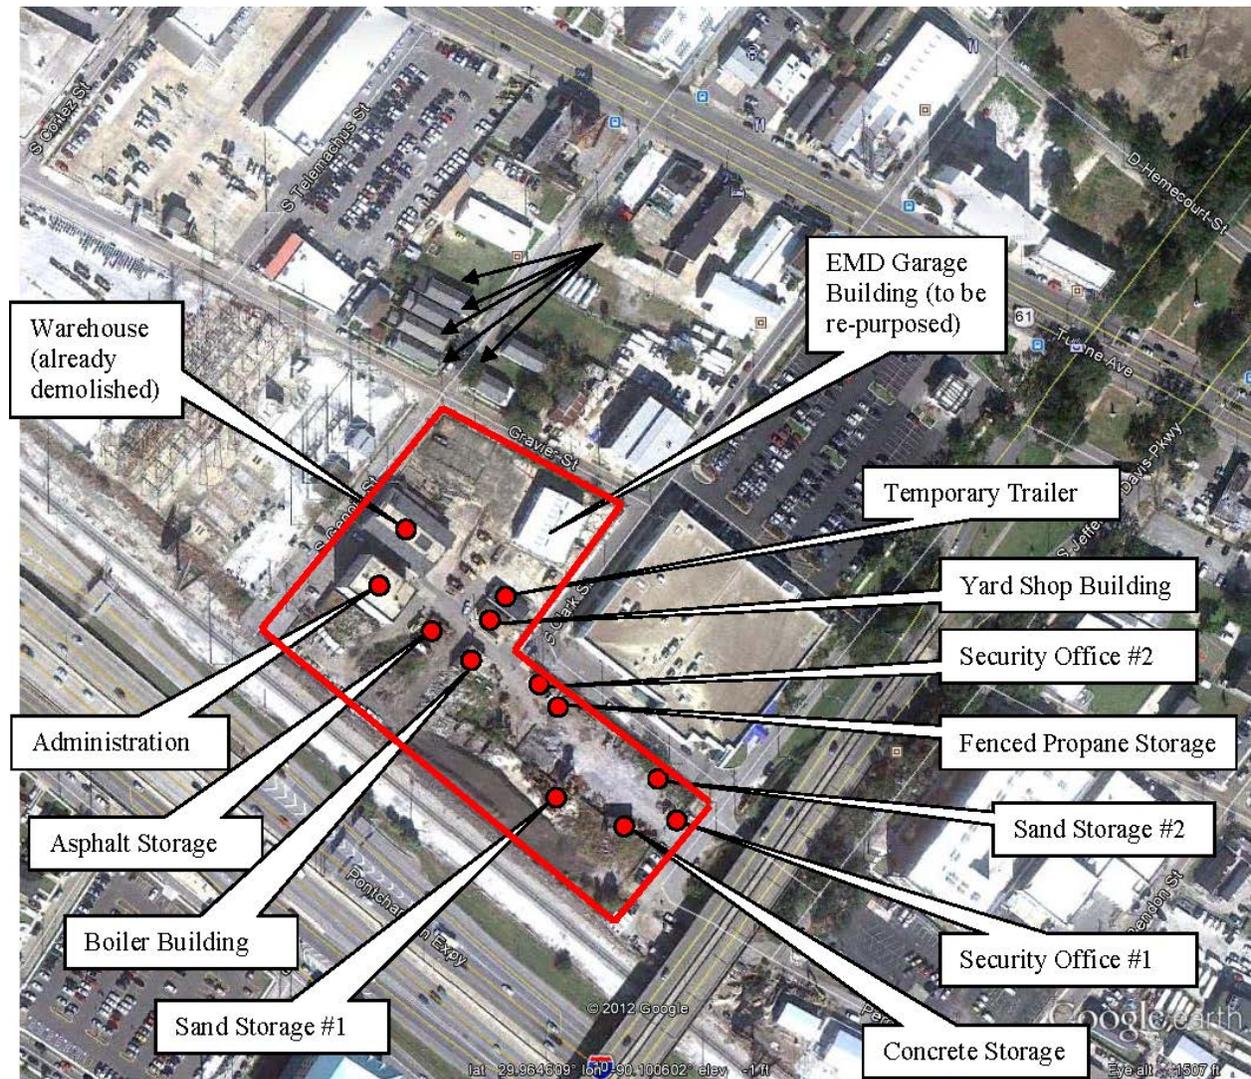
Existing structures at project site location (project site outlined in red). Structures to be removed/demolished prior to construction are indicated by red circles.
